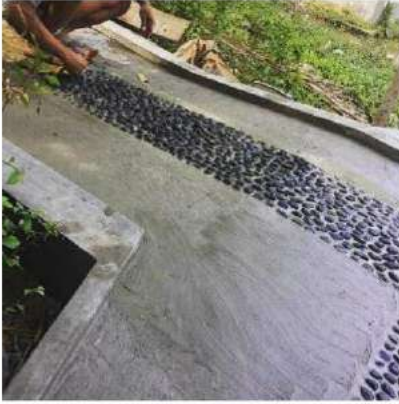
Construction of ramp and simple-rock-material-guiding path.
